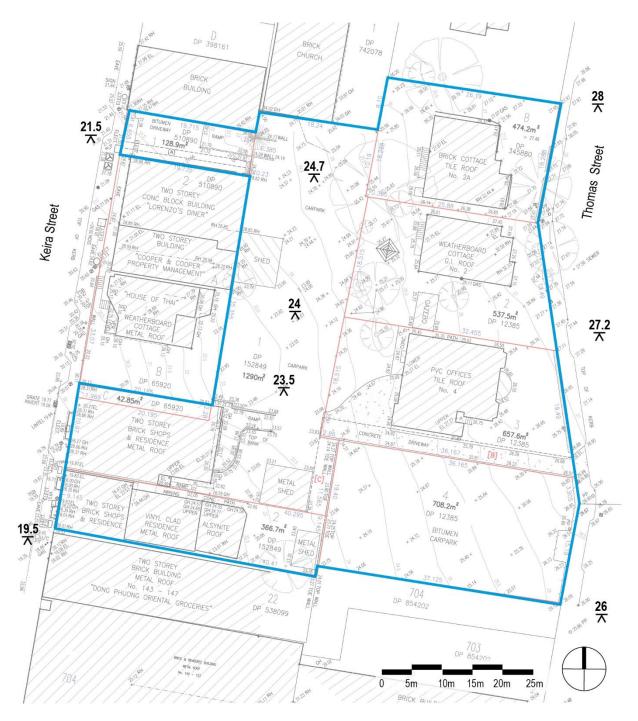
Existing site survey with the site outline shown in blue and key levels around the site noted in metres above Australian Height Datum (AHD). (Source: C Robson and Associates Pty Ltd with GML overlay)
